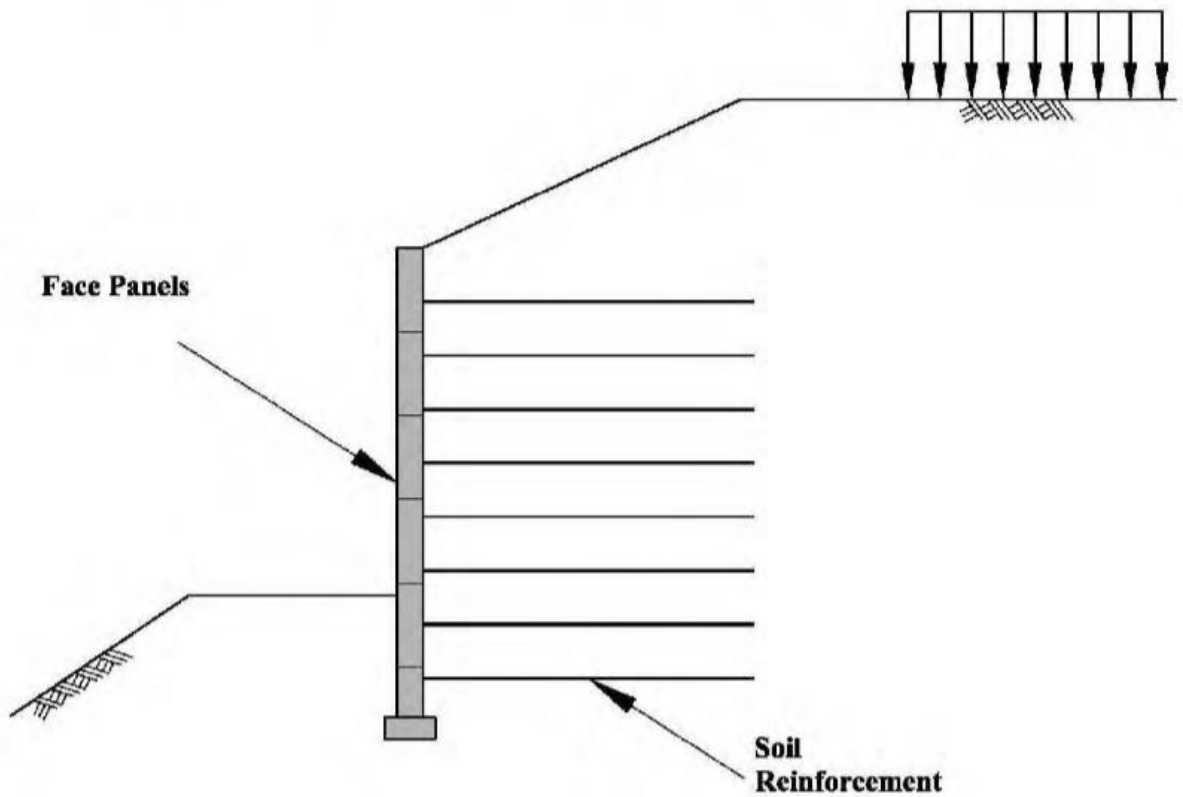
6: MSE Wall with Precast Concrete Face Panels
